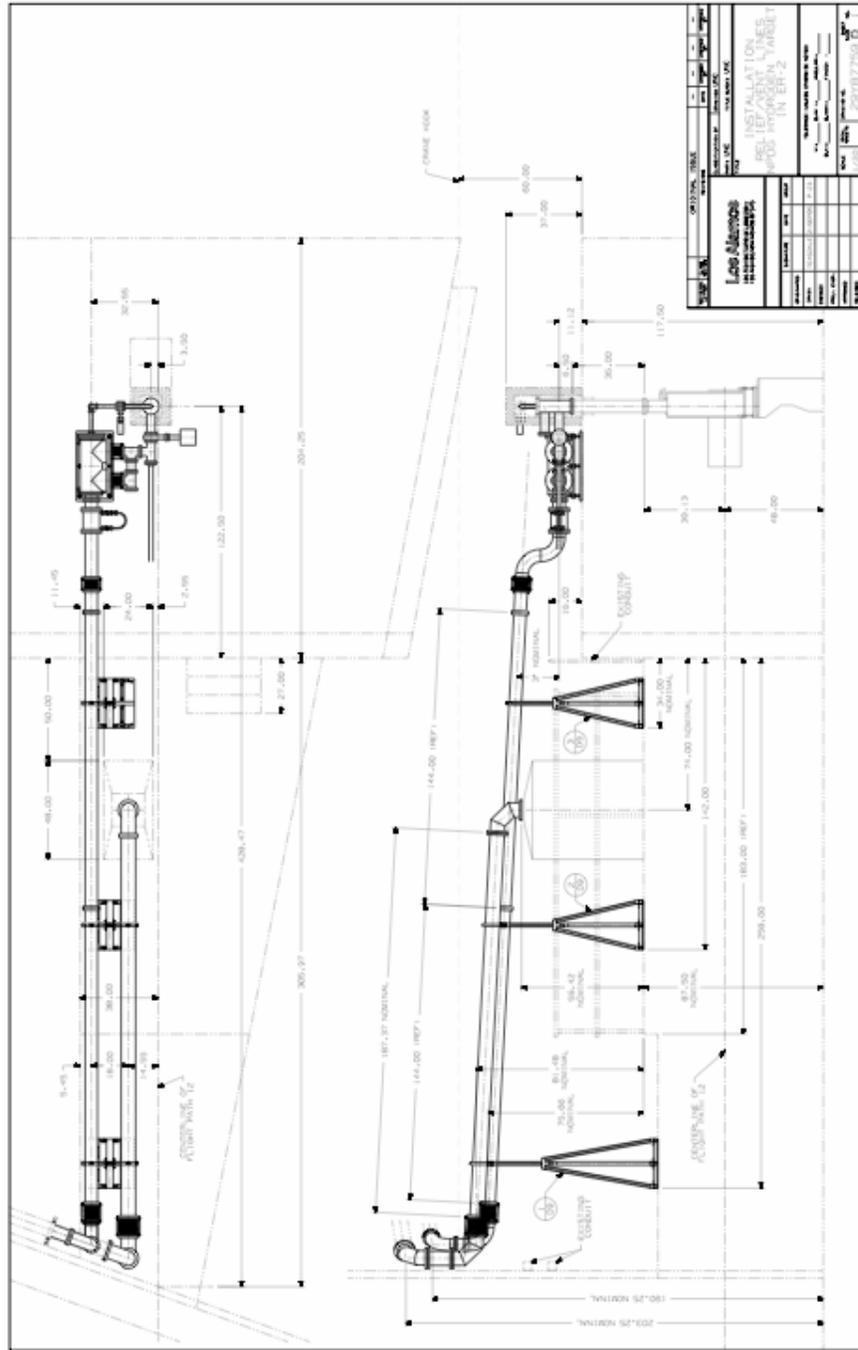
Vent stack and GHS ventilation piping on top of FP12 drawing # 29Y87759 D1.
